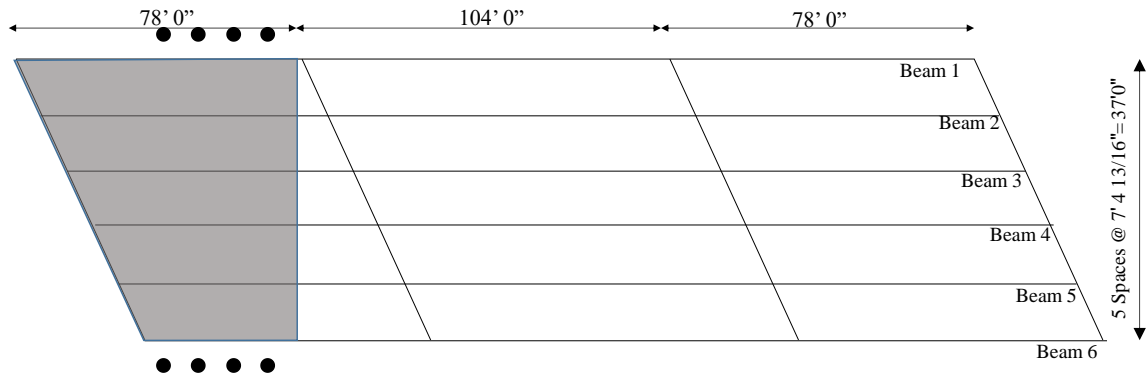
260 ft Standard Bridge Span 1 vehicle and wet concrete load for skewed bridges
